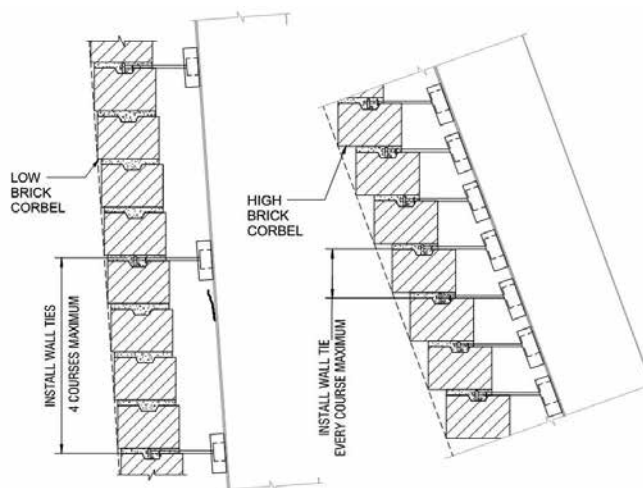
Wall sections showing tie arrangement for a near-vertical wall (left) and heavily corbelled wall (right).
